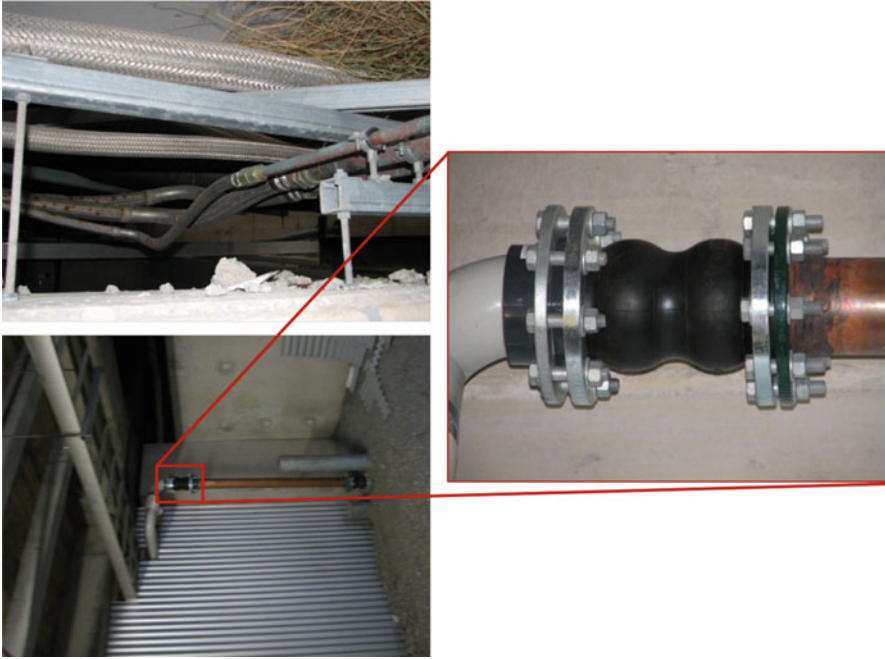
Flexible connections in base isolated buildings (Wellington Hospital, New Zealand)
